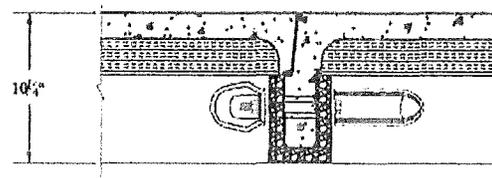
TYPICAL BEAM POCKET DETAIL
